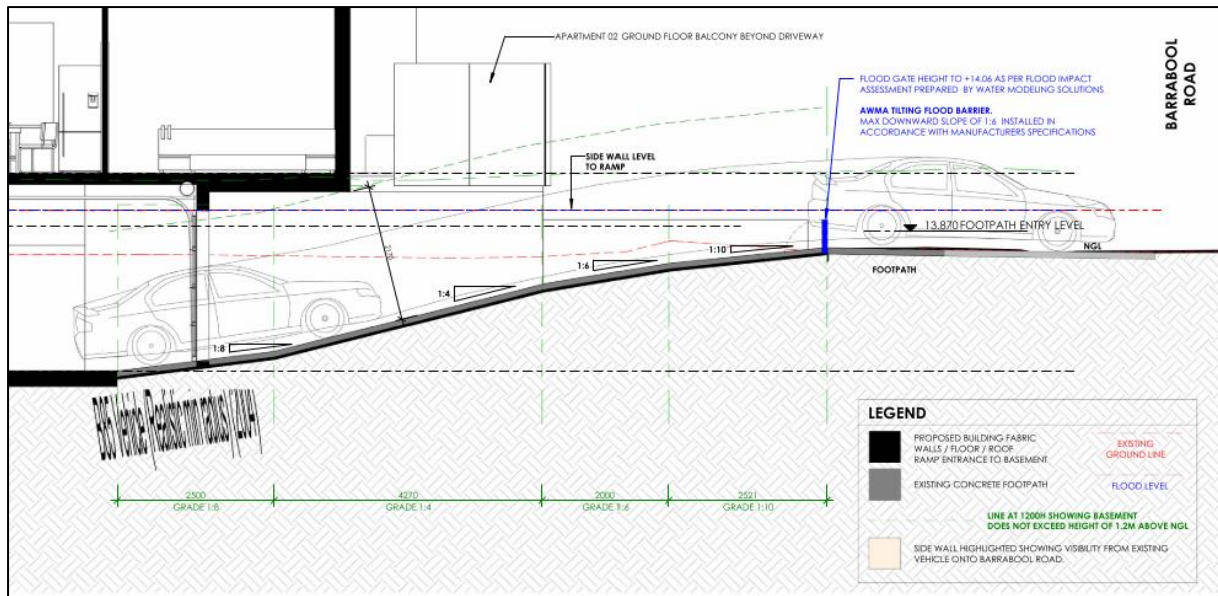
(Above): Section showing the ramp grade for the accessway at egress from the basement to Barrabool Road. Source: Application documents.
